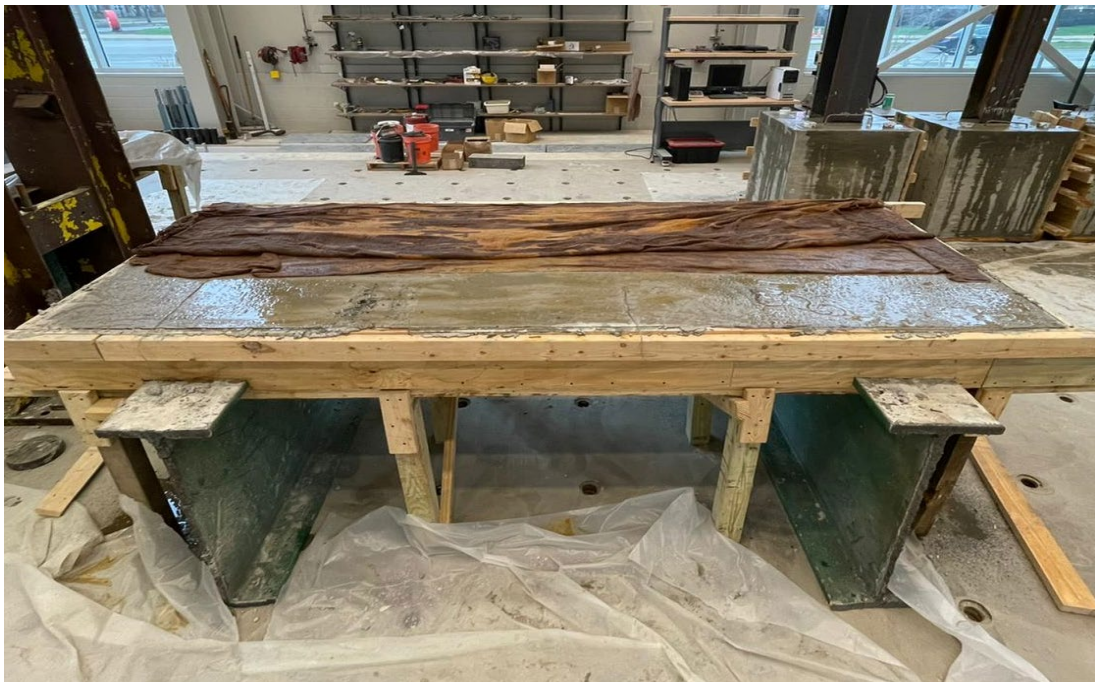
Concrete pouring of Single-span bridge deck Prototype 4.
